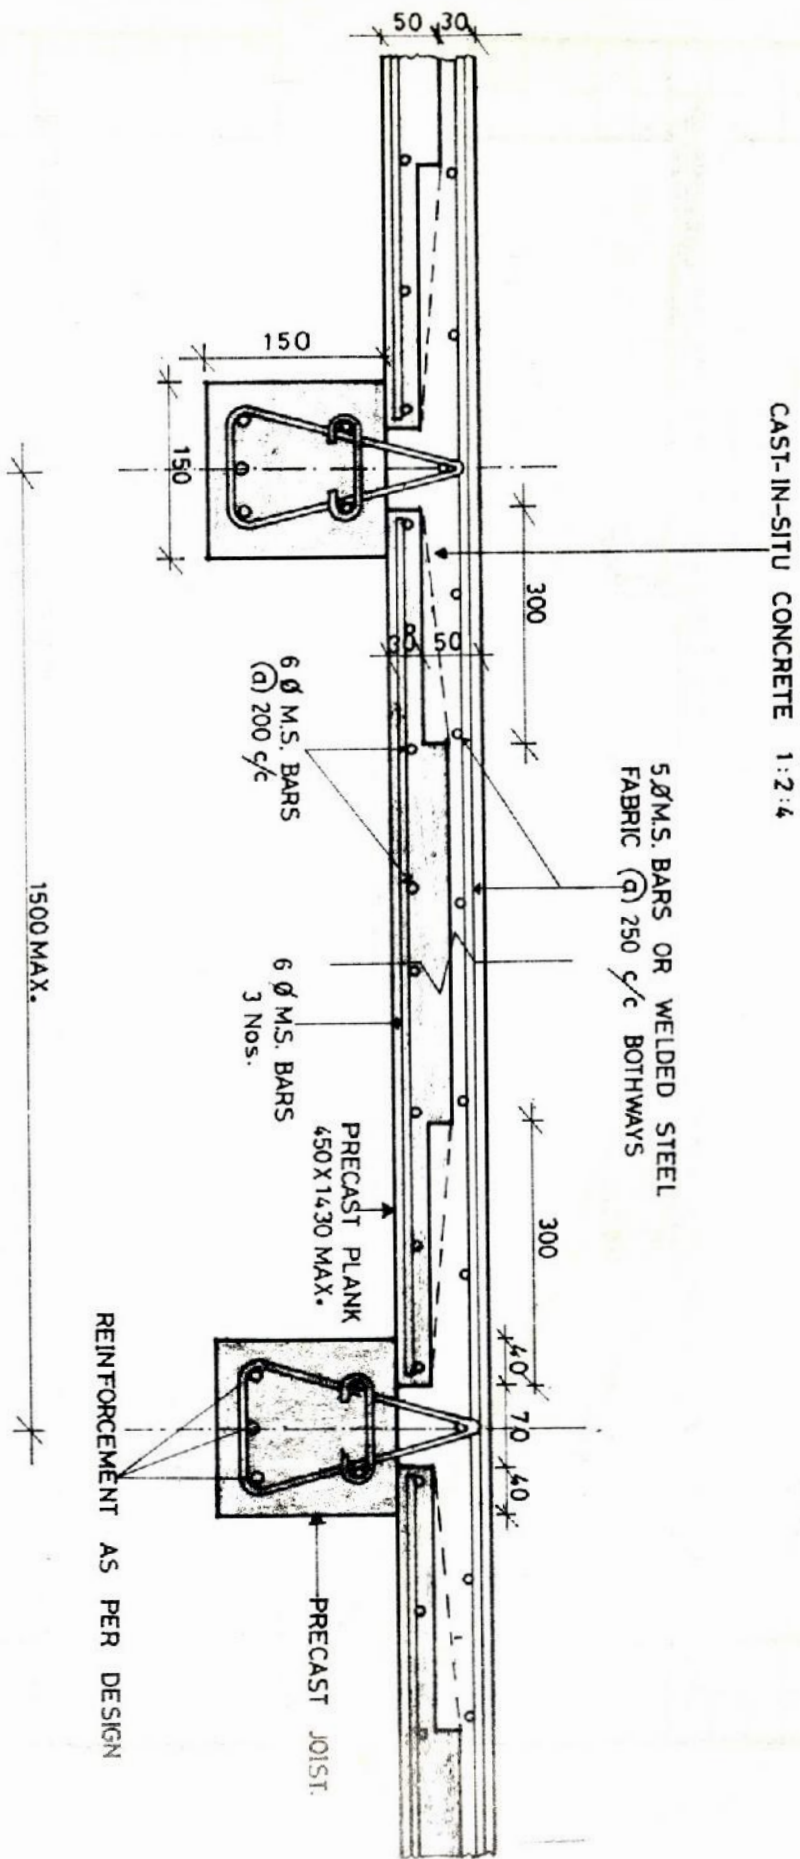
PRECAST R.C. PLANK FLOORING/ROOFING SCHEME
